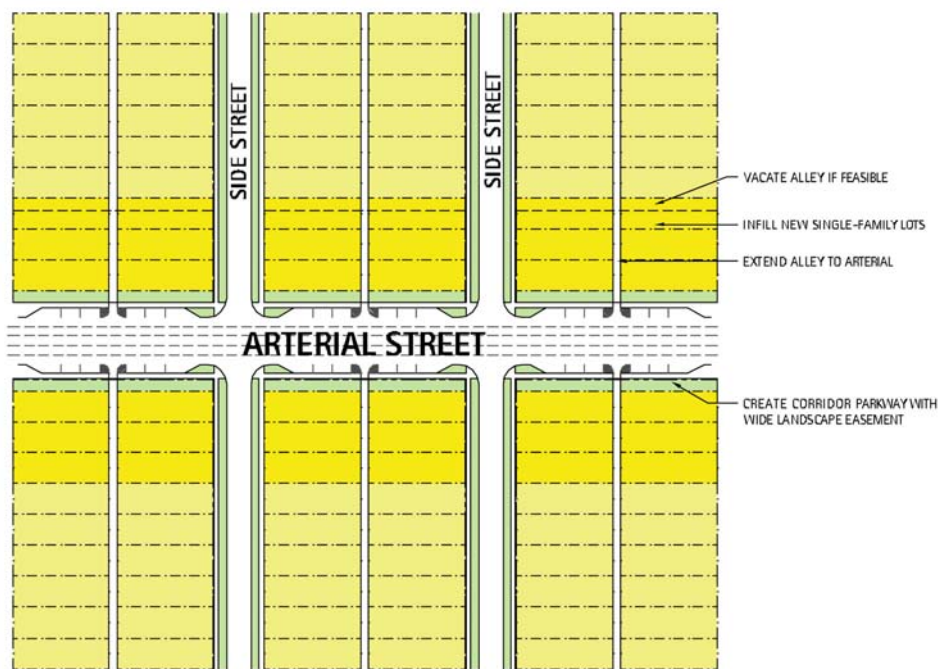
Landscaped Parkway with Lots facing Side Streets
